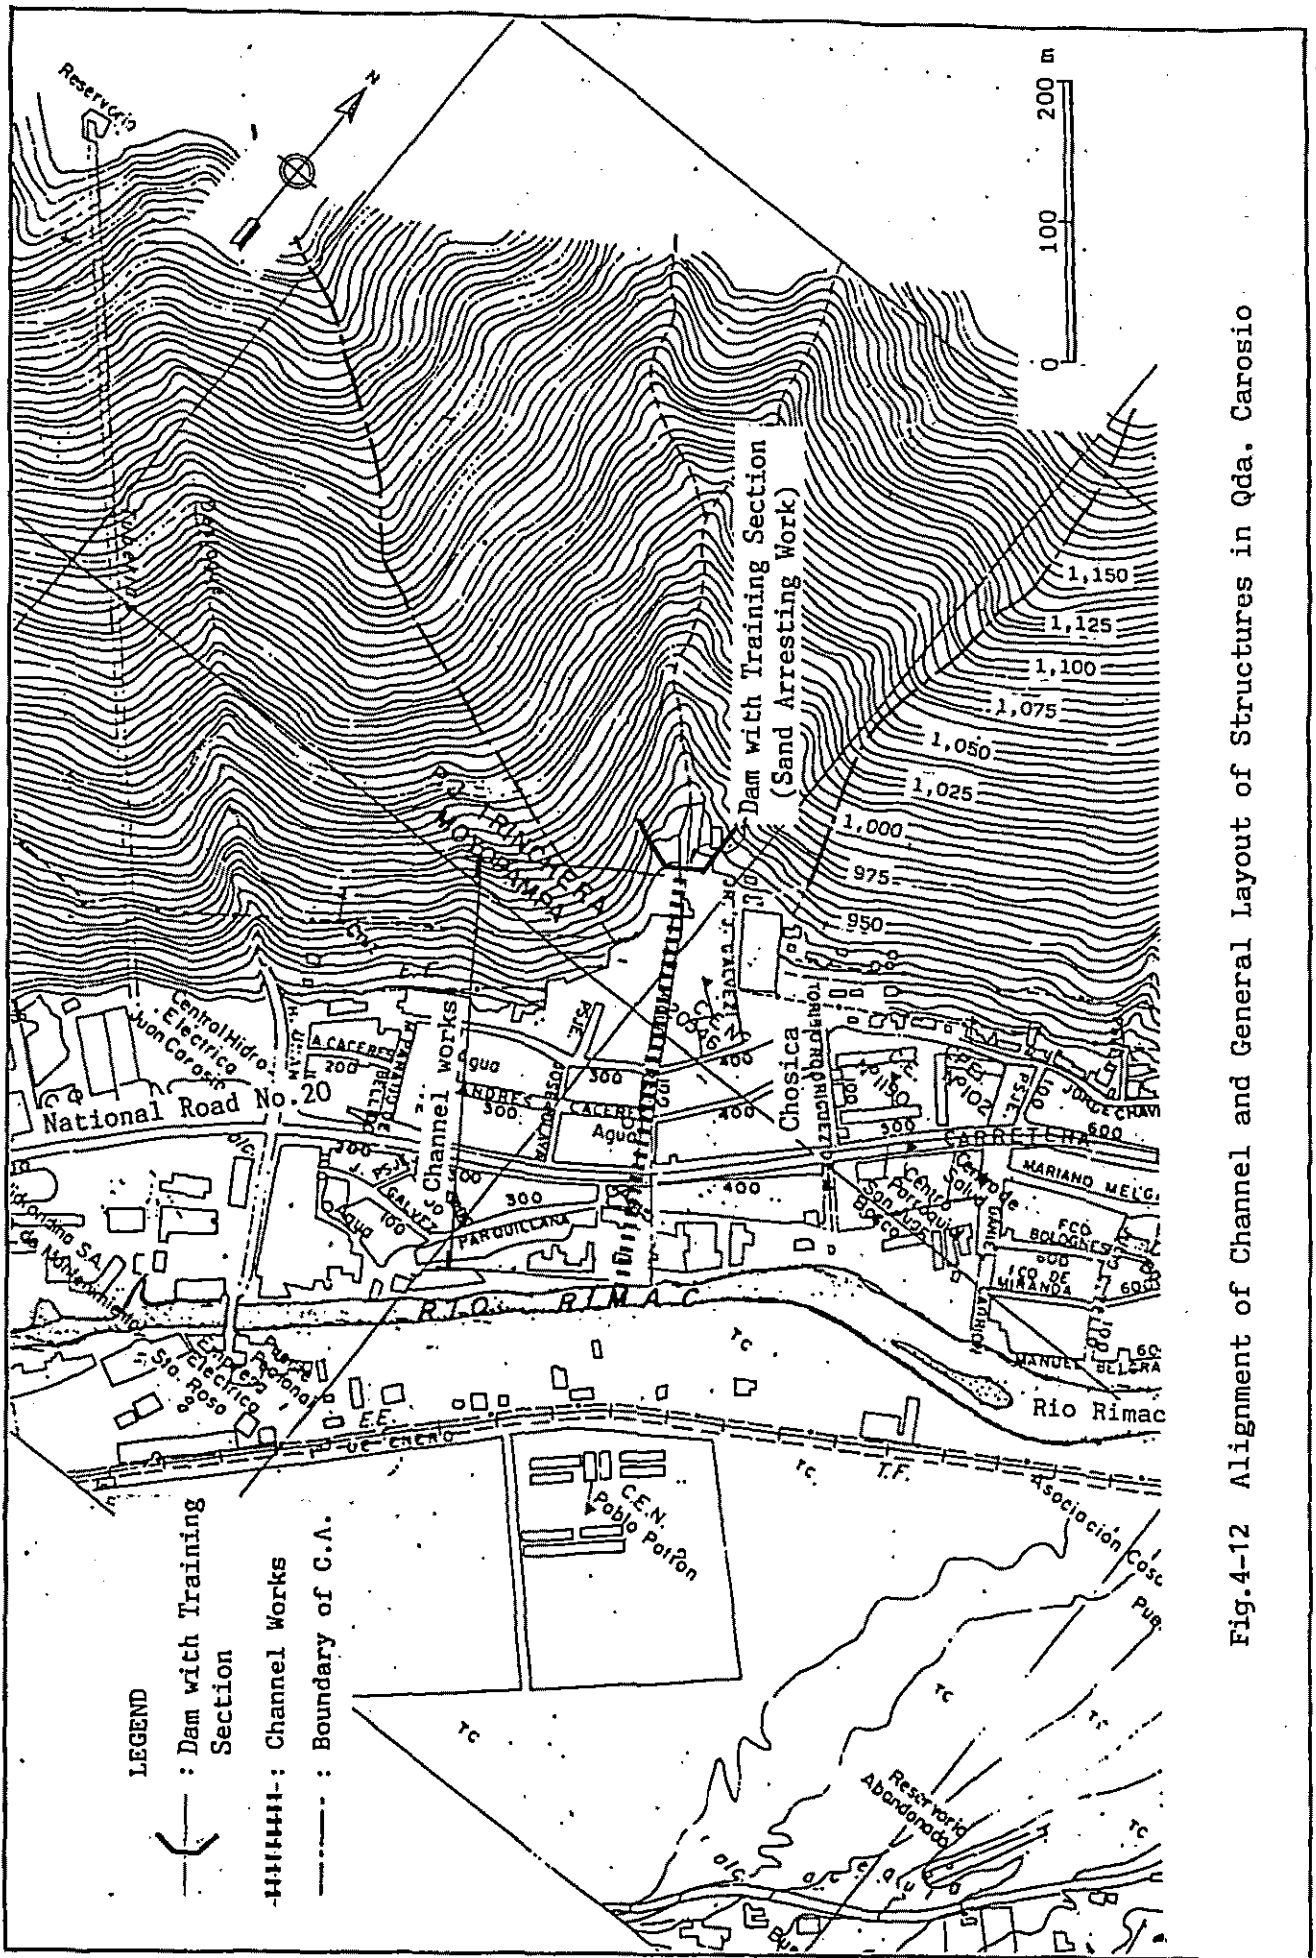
Alignment of Channel and General Layout of Structures in Qda. Carosio
